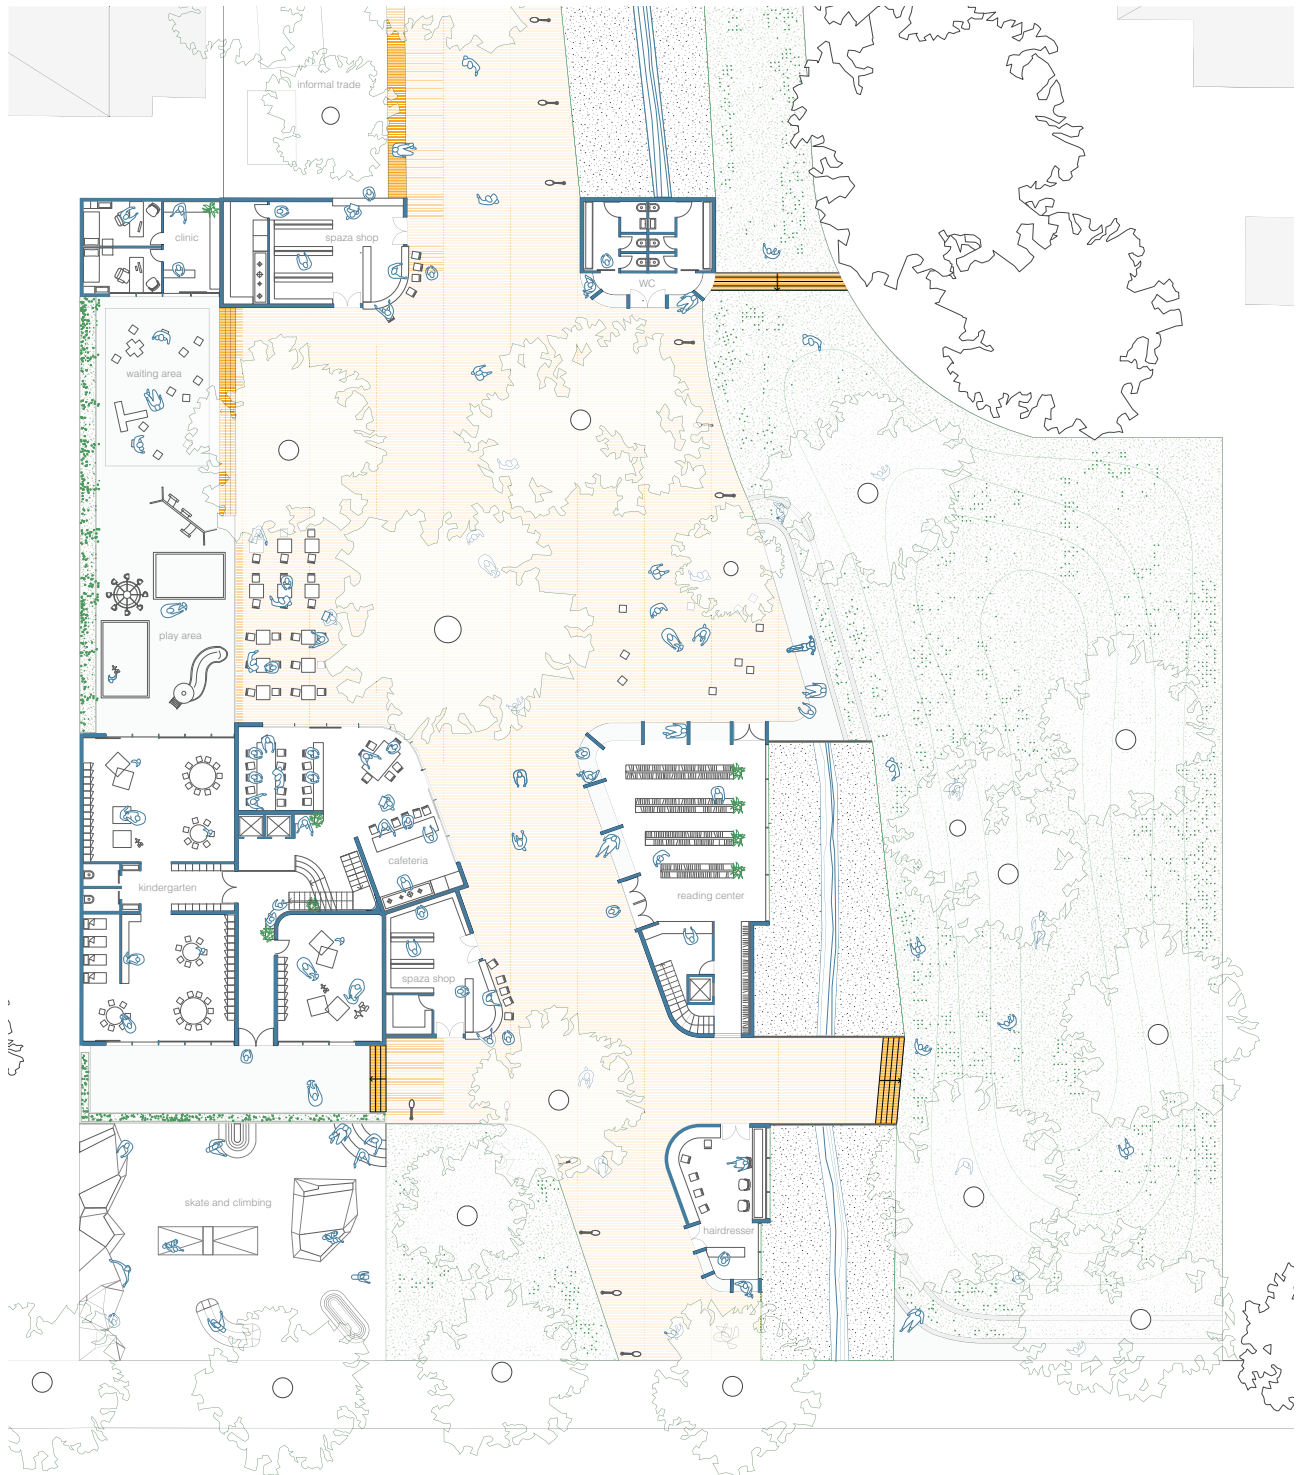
Ground Floor Plan of Piazza and Surroundings
